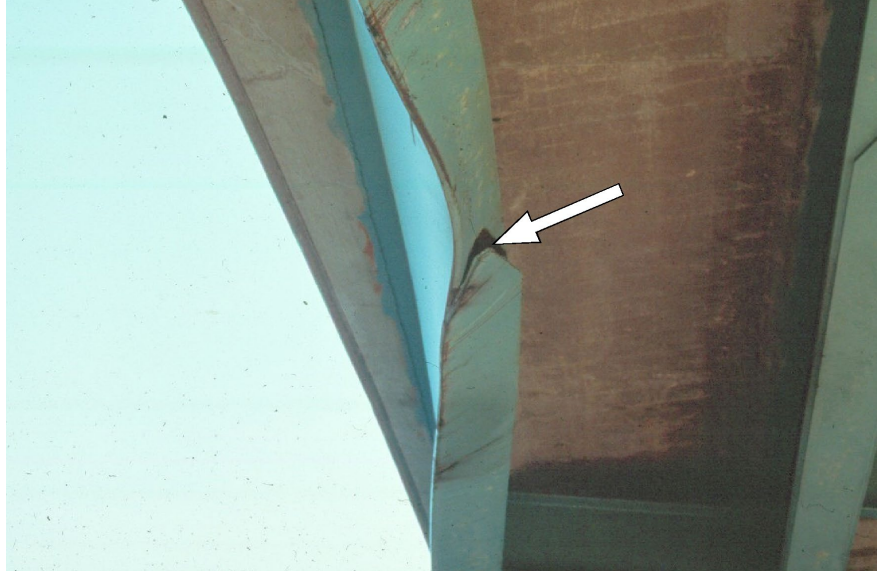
Collision Damage on a Rolled Beam Bridge
